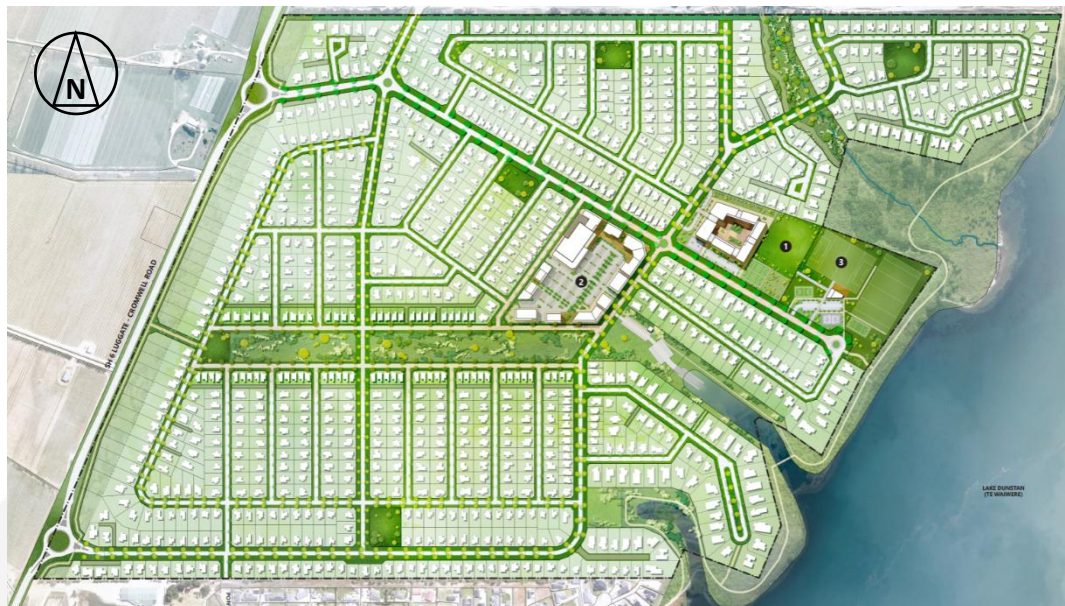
Proposed Masterplan (Extract from Woods Drawing)
